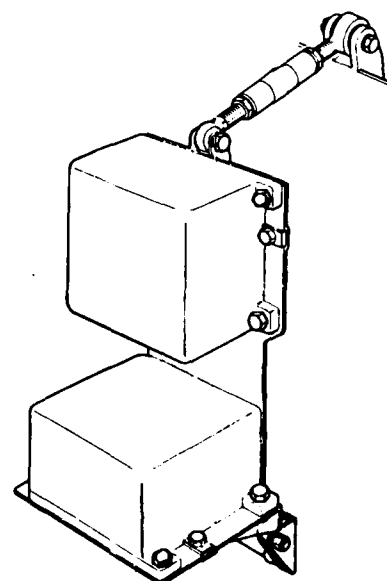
PLATFORM-MOUNTED EQUIPMENT
